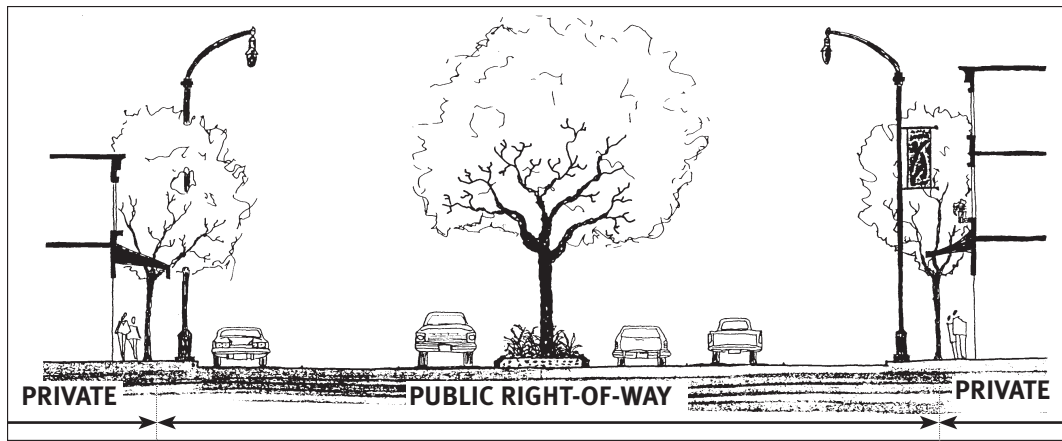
Typical street section on El Camino at a mid-block location, showing a full 11' median with mature trees, low landscaping and street trees planted in the 10' effective sidewalk area.
